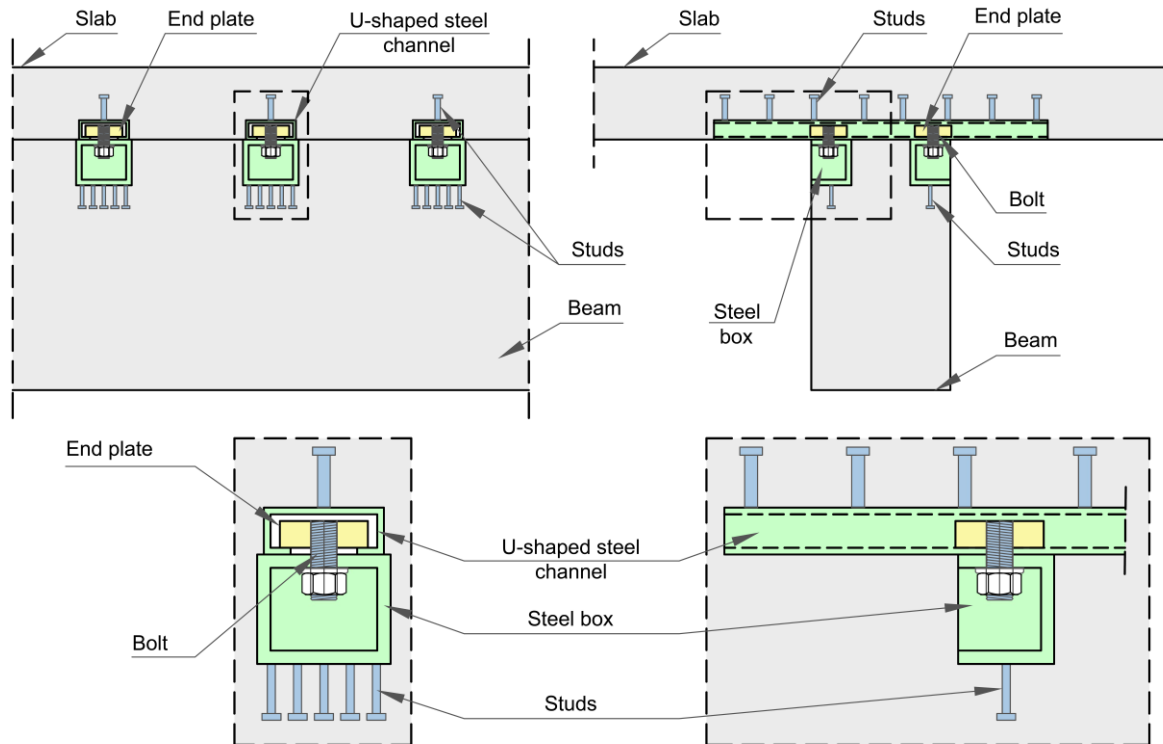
Demountable slab-to-beam connection with steel channels and boxes - adapted from [34]–[36]
